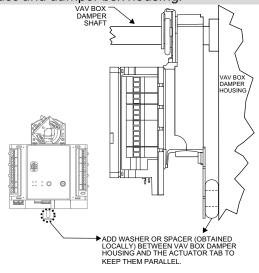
Mounting Controller to VAV Box Damper Housing when Actuator is not Parallel to VAV Box Damper Housing
